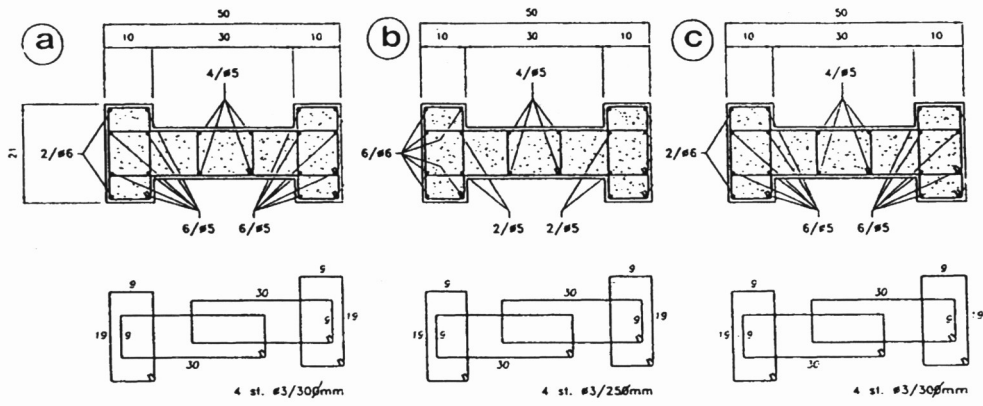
Reinforcing pattern; (a) pier A; (b) pier B; (c) pier C
